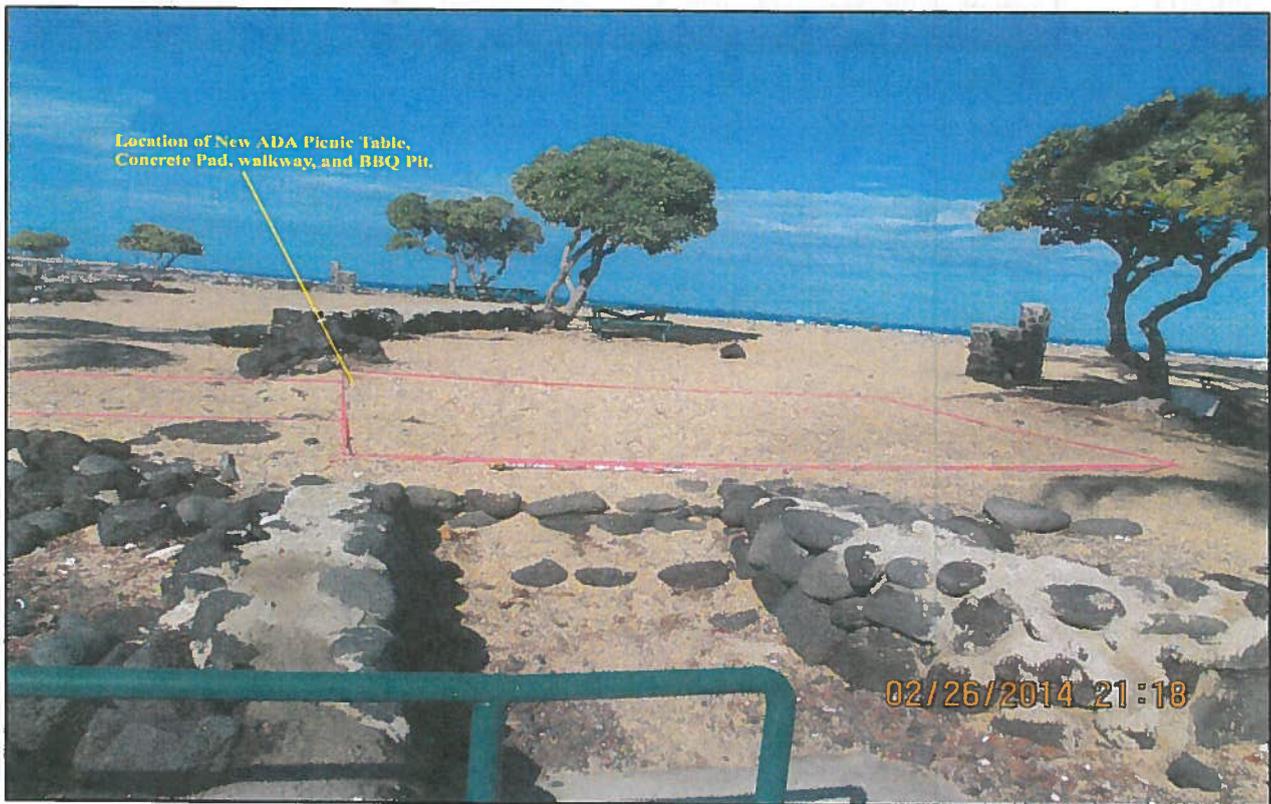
The proposed location of the new ADA picnic table, concrete pad, walkway, and a new BBQ pit highlighted in pink. View is to the west (*makai*).
